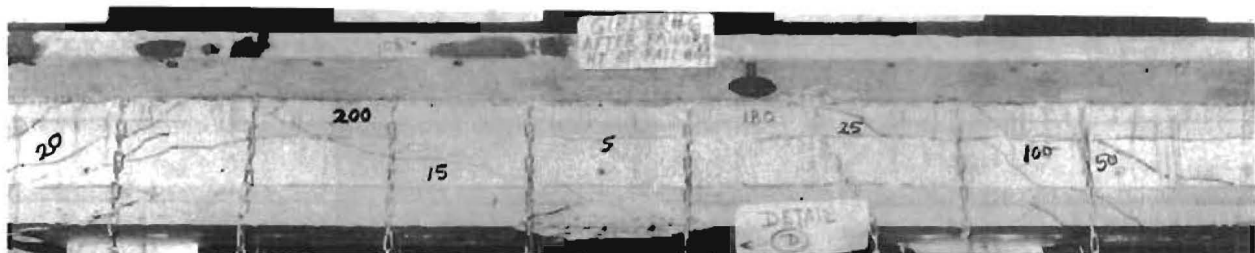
Bridge 2, damages in girders due to equal lateral impacts.
